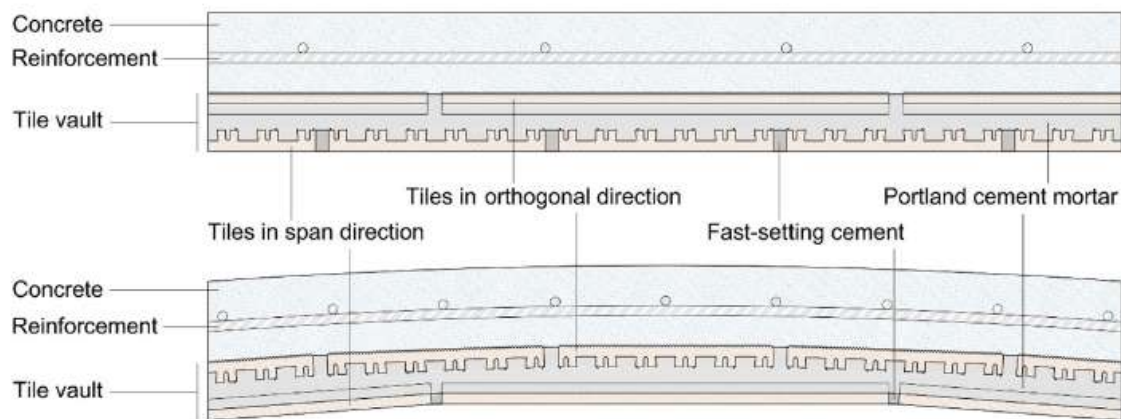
Cross section of the vault in both direction and arrangement of tiles (Lopez 2019)
